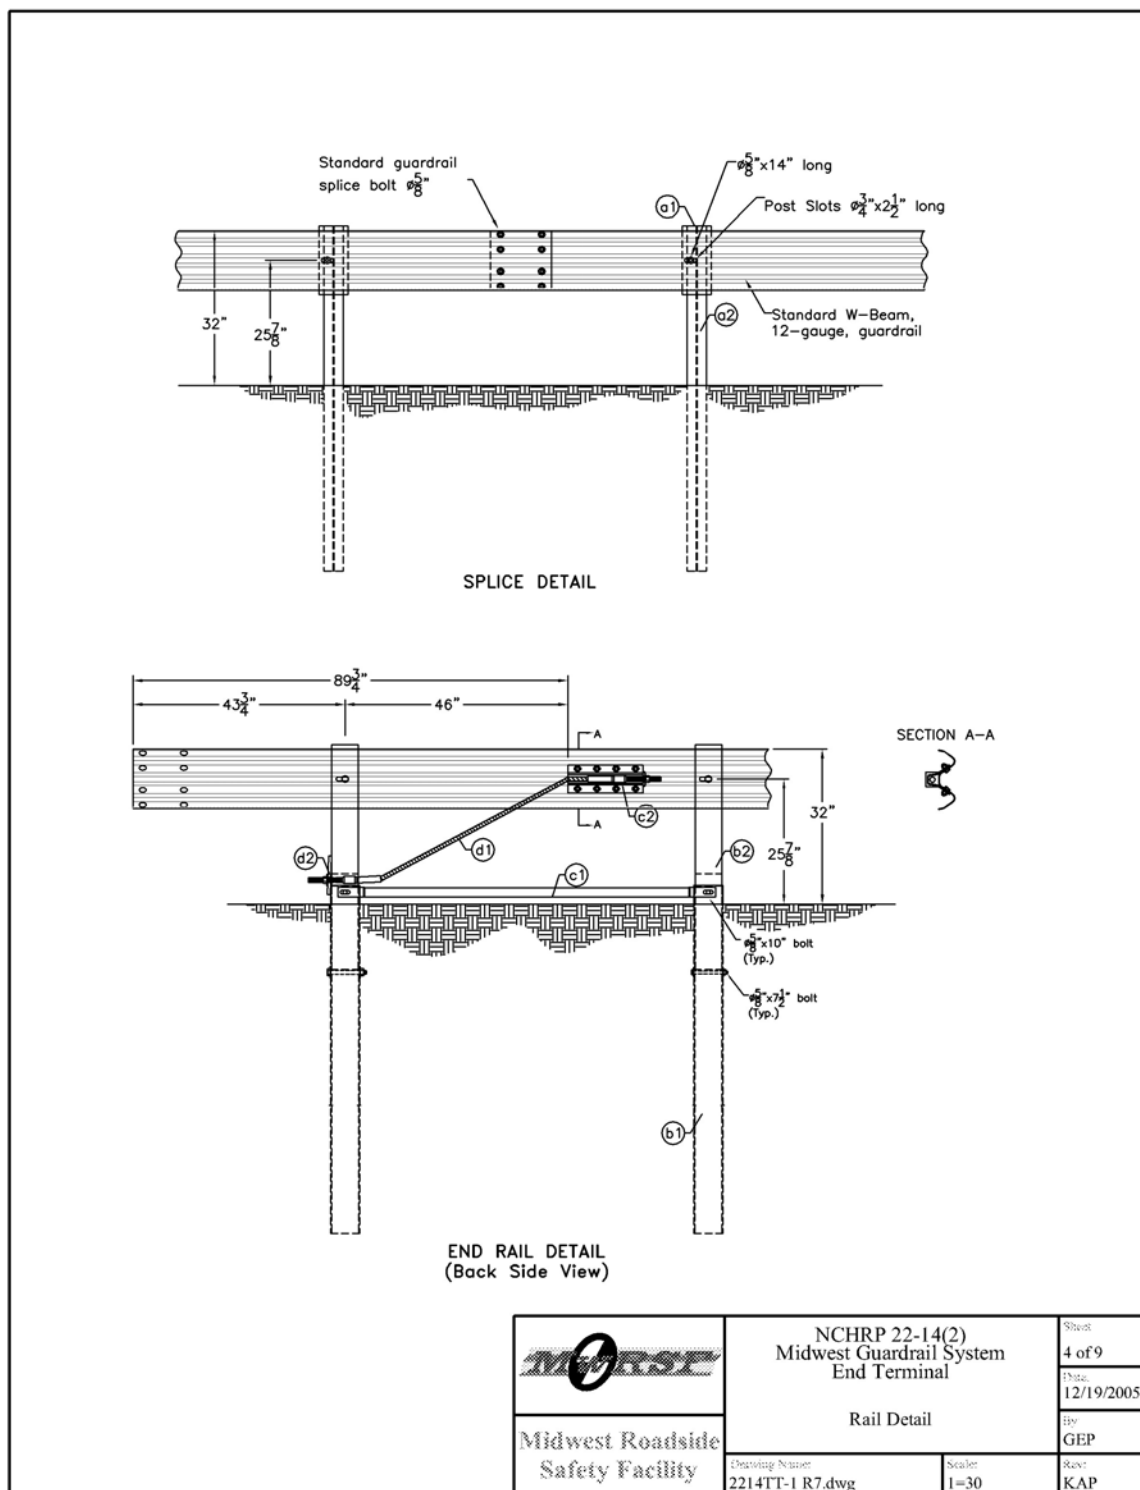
Midwest Guardrail System End Terminal - Rail Details (English)
